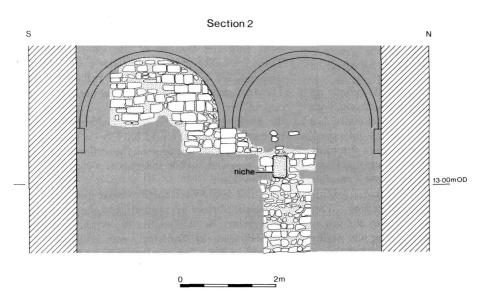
Well Court: Building 12, elevations of interior (1:80).
